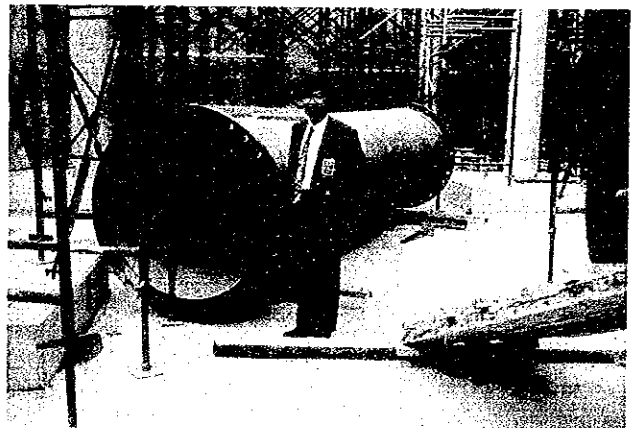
Ductile cast iron pipe used for water distribution and drainage
